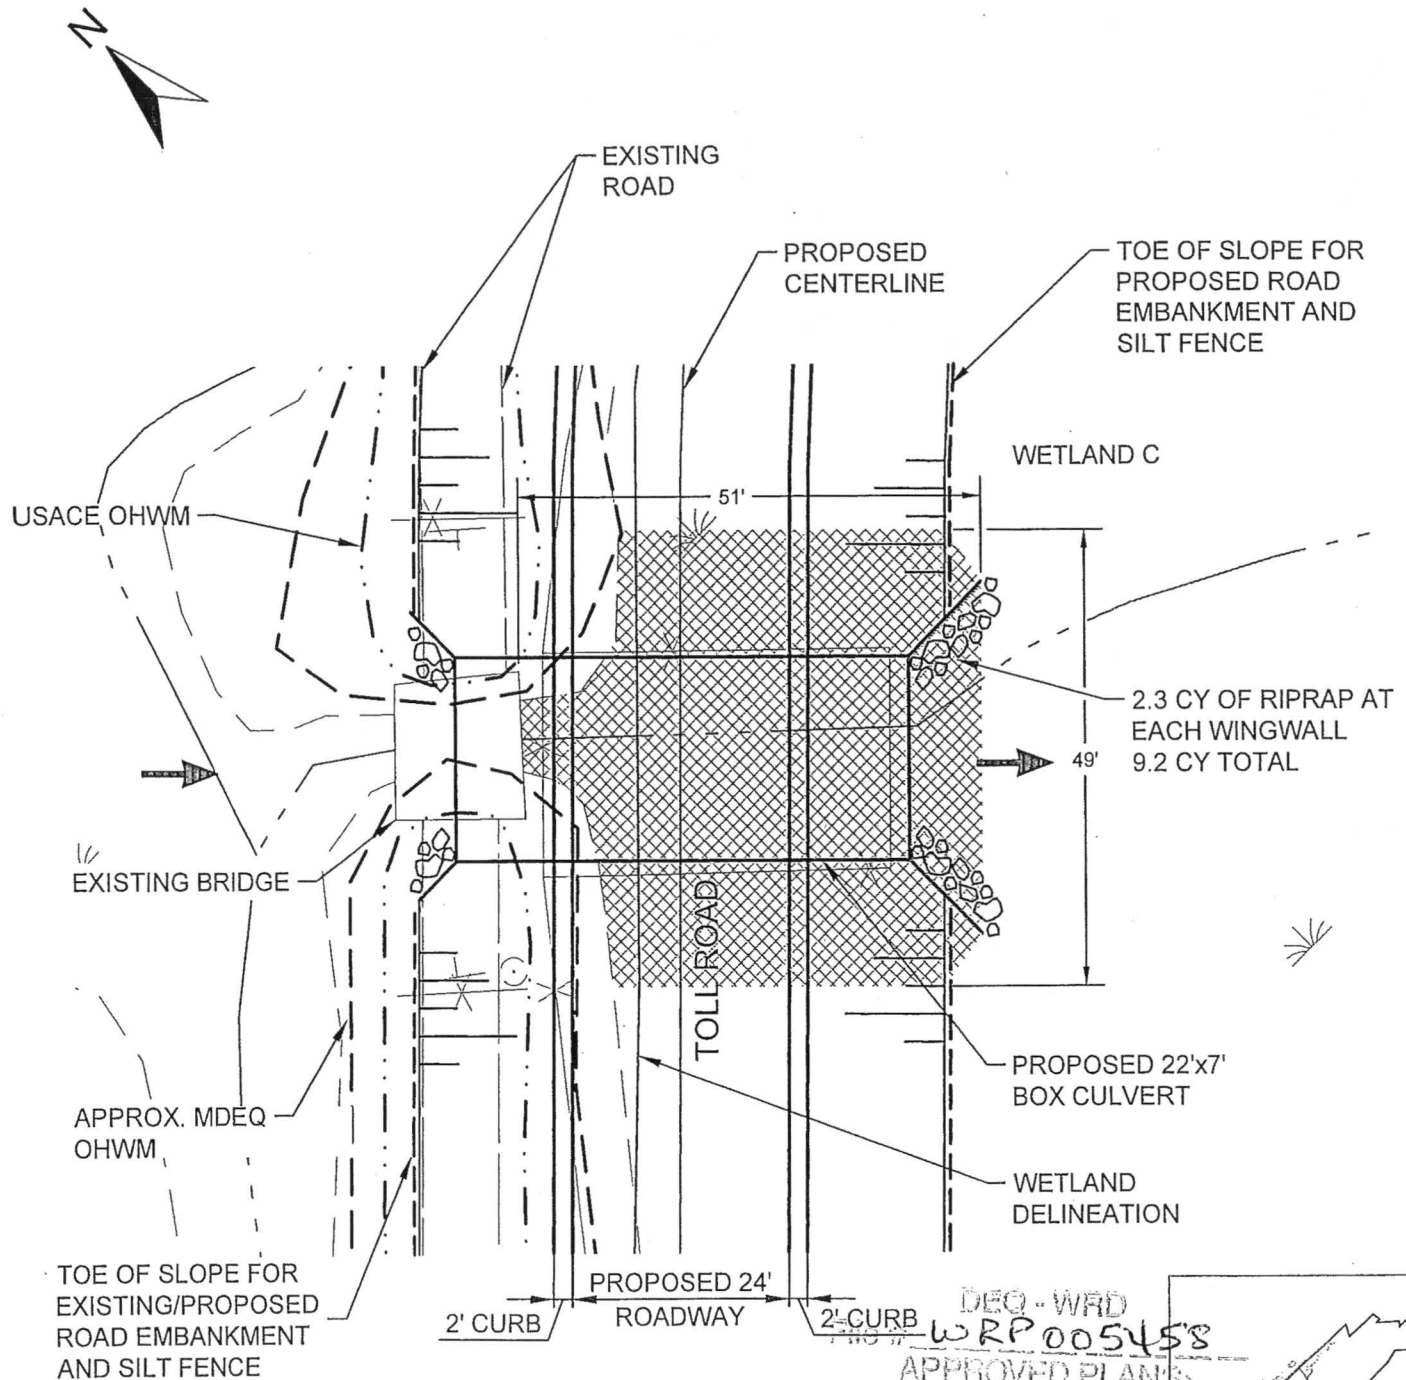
A NEW OPERATIONS ACCESS ROAD PLAN VIEW
